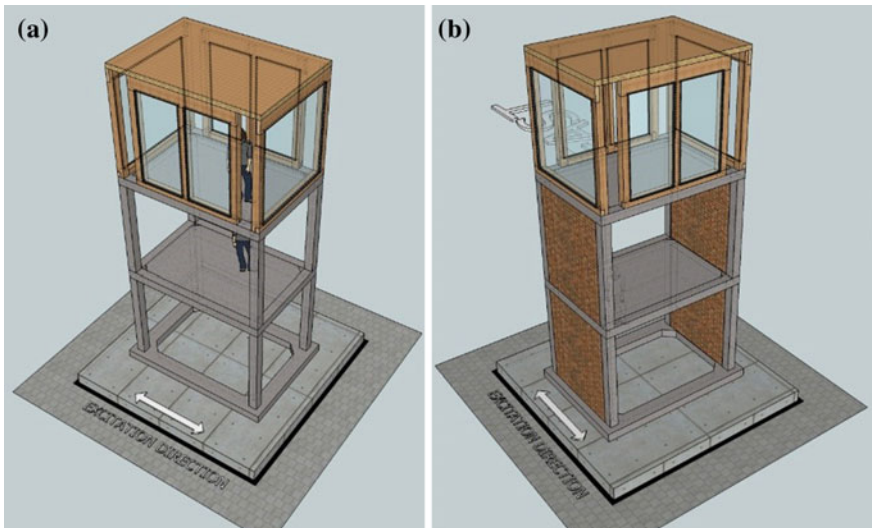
Timber-glass module installed onto the concrete frame (a) or masonry (b) model building [112]
